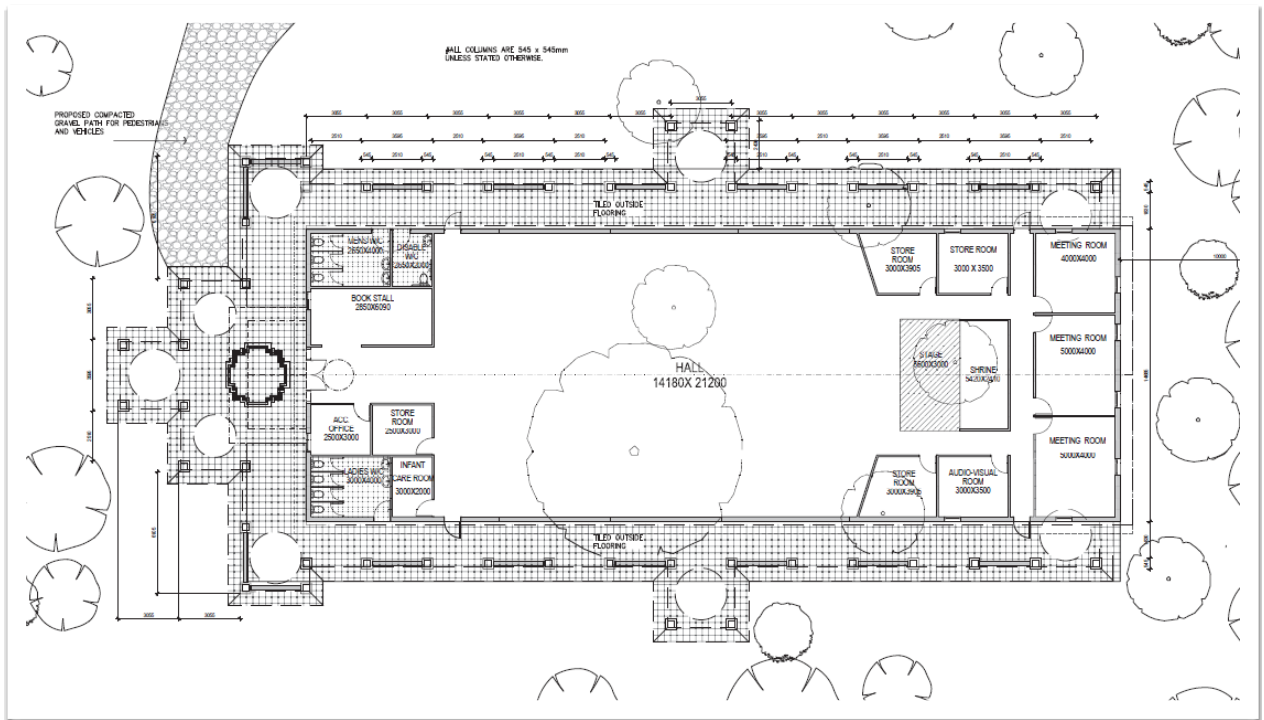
Proposed floor plan. Source: Application plans submitted 13/09/2021
